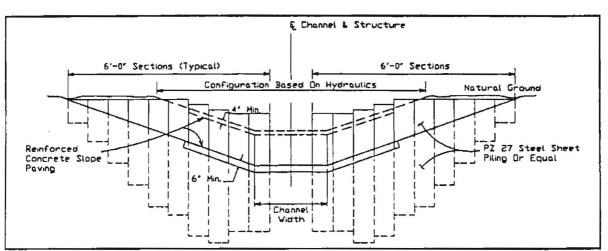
Cross-Section of Typical Straight Drop Spillway
